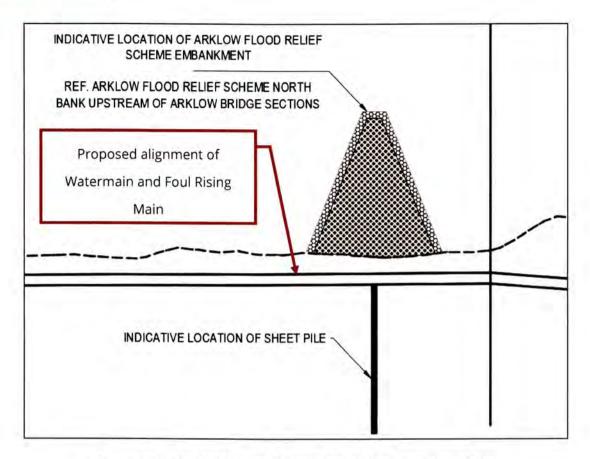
Indicative Section of Crossing with Flood Protection Berm
